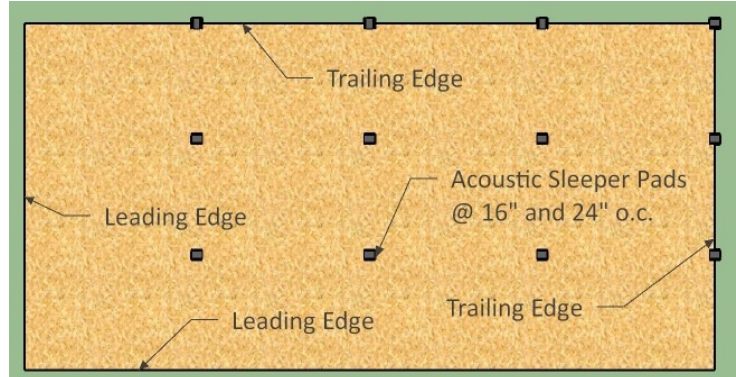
Typical Inverted Plan for lower panel on concrete and other decks
